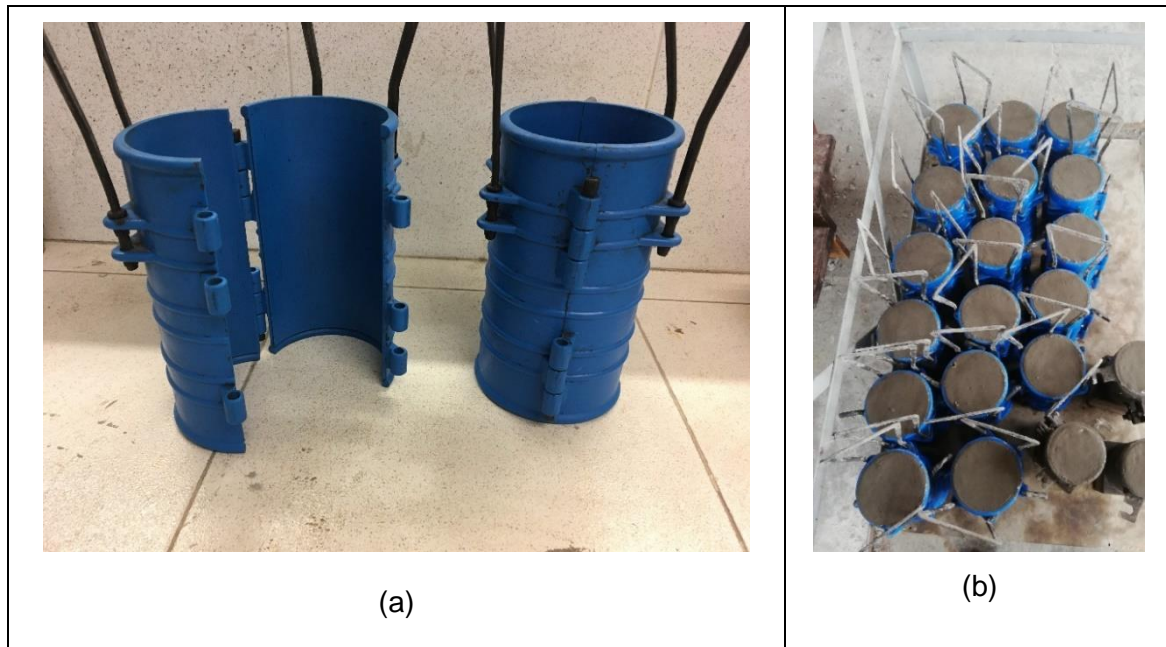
(a) Plastic molds for concrete (Φ 4” x 8”). (b) Molded specimens after concrete mixing.
